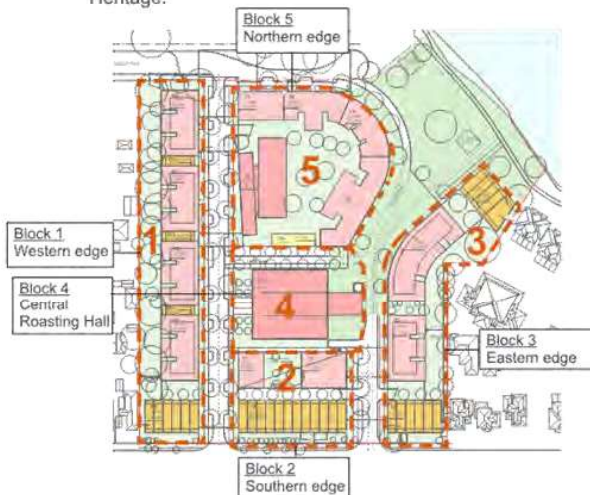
Key buildings of the amended PP (Feb 2019) identified over the Roof Plan (Source: BVN 2019)
